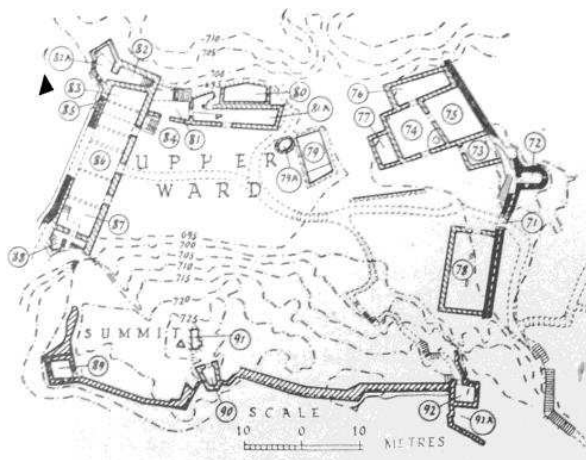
Department of Antiquities Plan, detail showing the postern n. 83 (Megaw, 1963).
